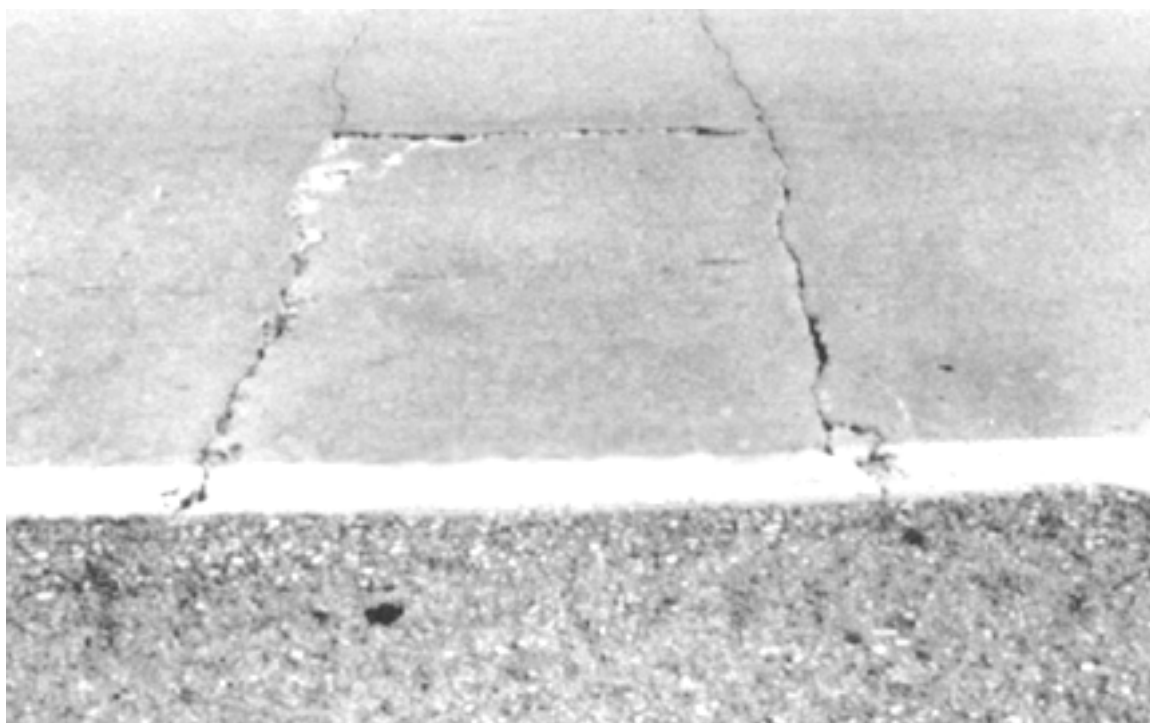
Example of punchout in continuously reinforced concrete pavement.
